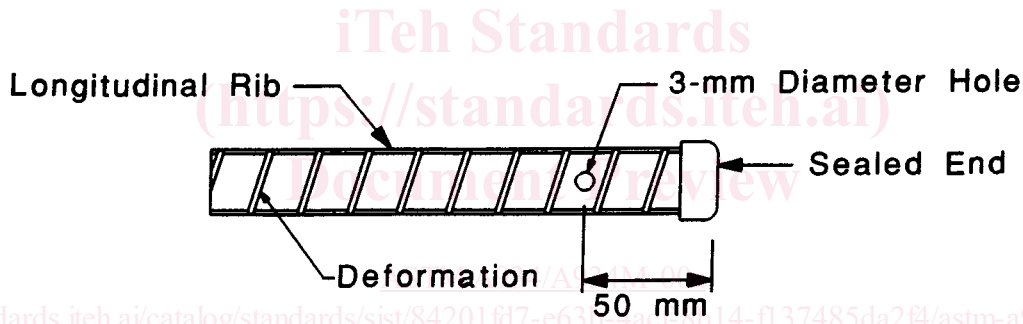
Cathodic Disbondment Test Equipment Configuration
